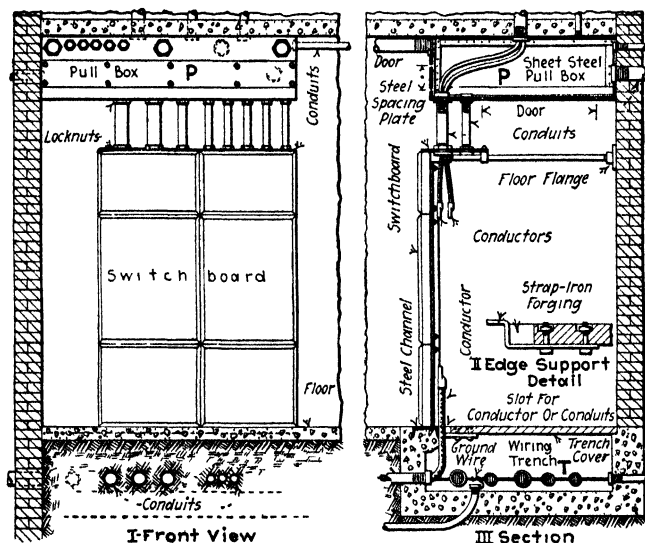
Switchboard having a pull box over it and a wiring trench under it. Unless a steel box is used to line the wiring trench or unless some similar provision is made, the ends of all of the conduits which enter the trench must be bonded together with a copper ground wire. This wire must be connected to a permanent ground or to some permanently grounded object. The switchboard metal frame must be similarly grounded.
